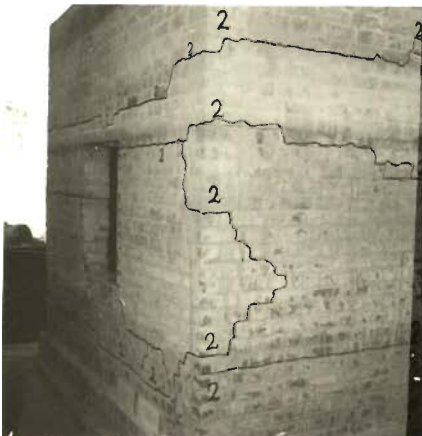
\_ SOUTH WALL BROKEN INTO DIFFERENT BLOCK (MODEL 6)
